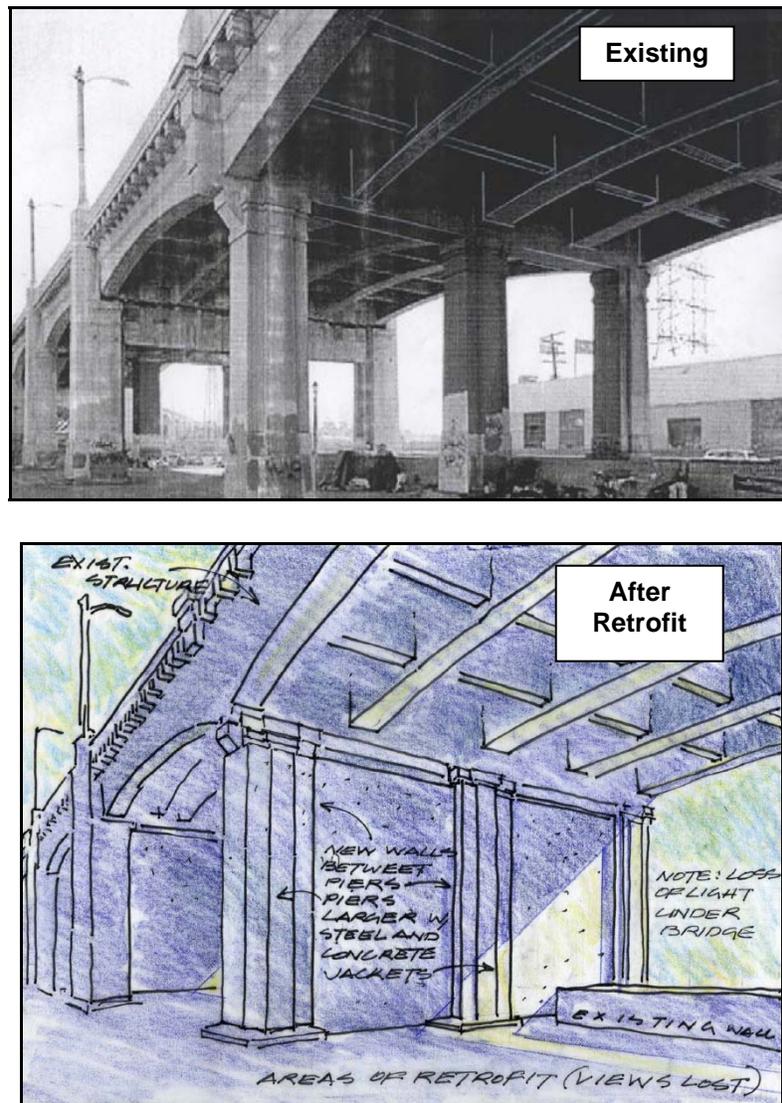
Conceptual Drawing Alternative 2 – Retrofit
